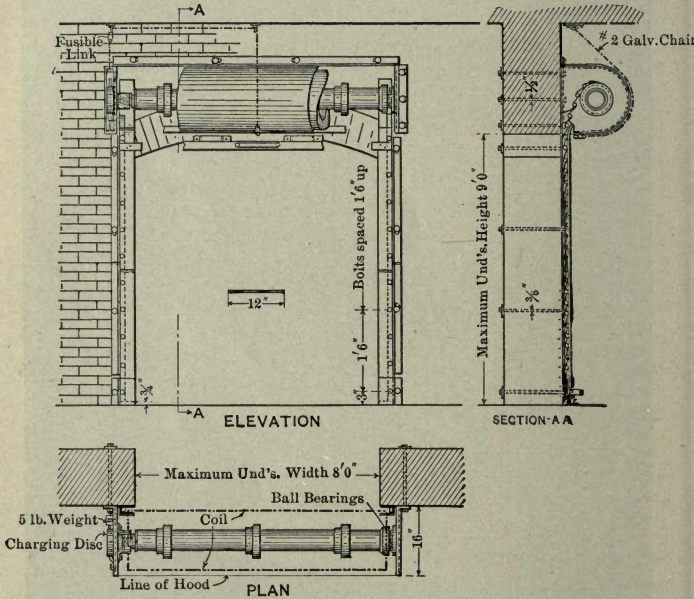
"Wilson Arrangement No. 1" Steel Rolling Door.
